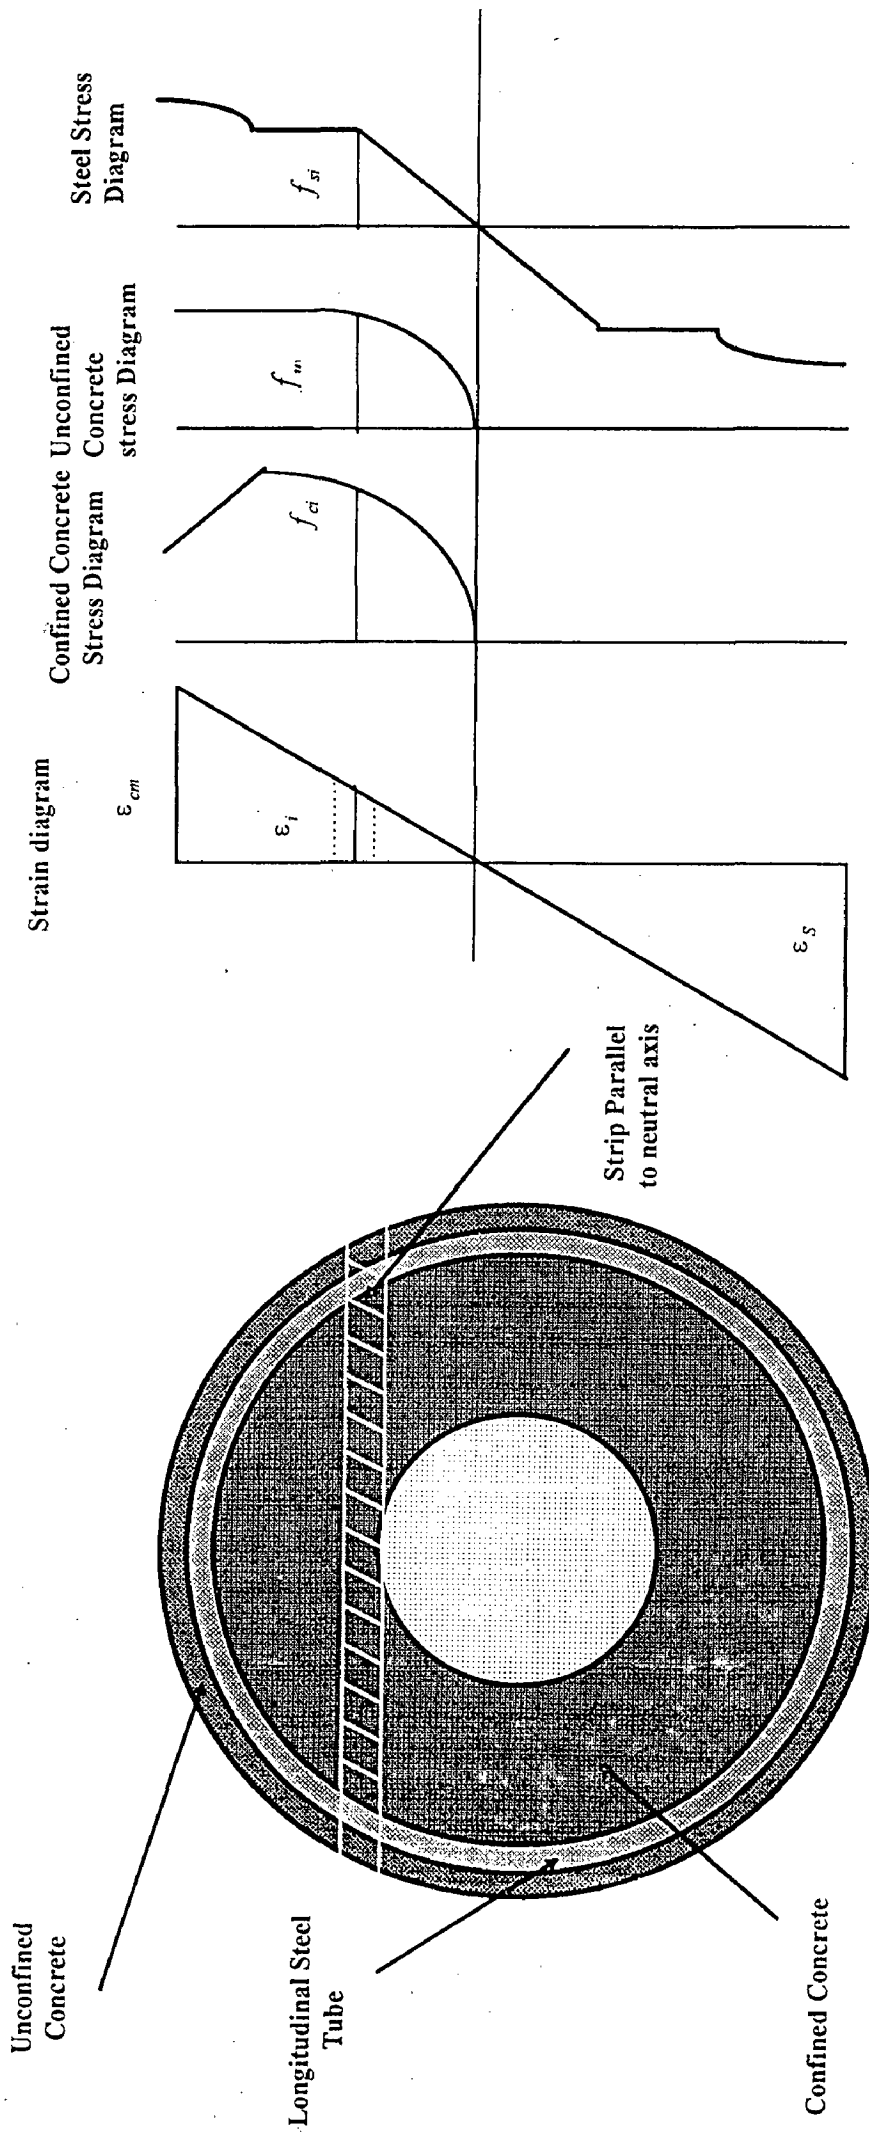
Stresses corresponding to Strain in Unconfined concrete, Confined concrete and Steel
